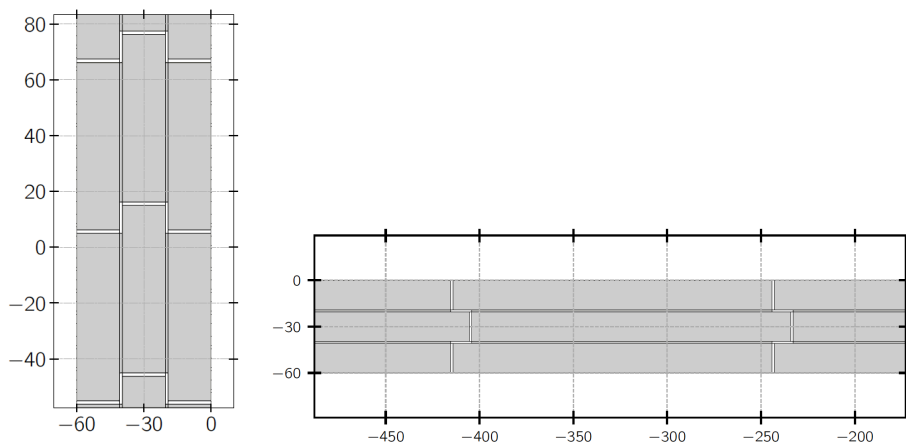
(upper) Vertical and (lower) horizontal cuts on a single wall showing the arrangement of
